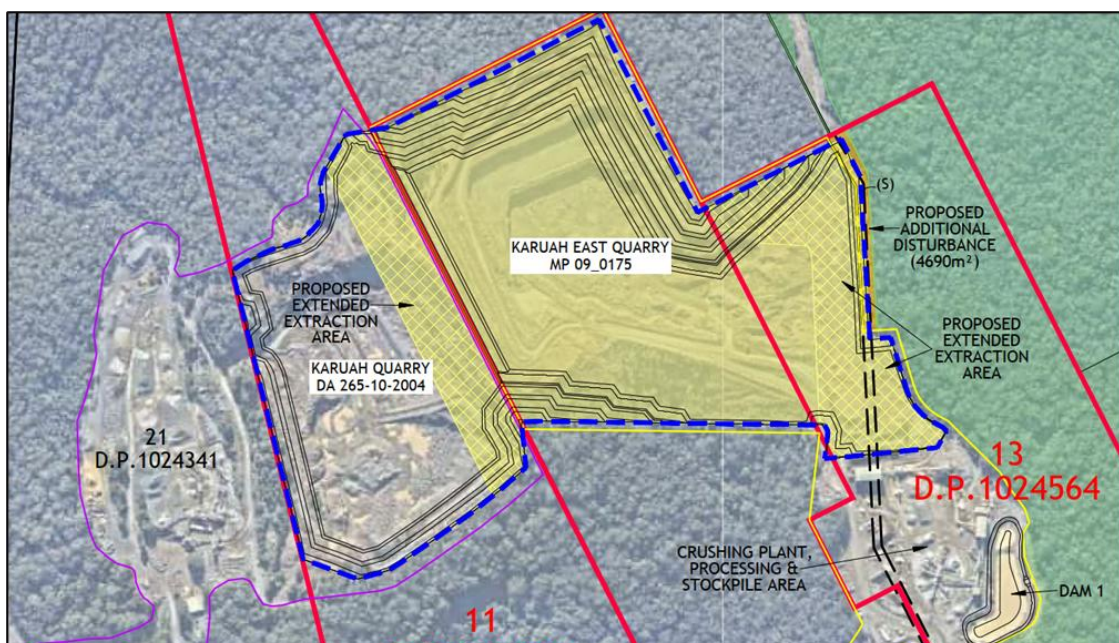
Site Plan of Proposed KEQ within Consolidated Extraction Area.
